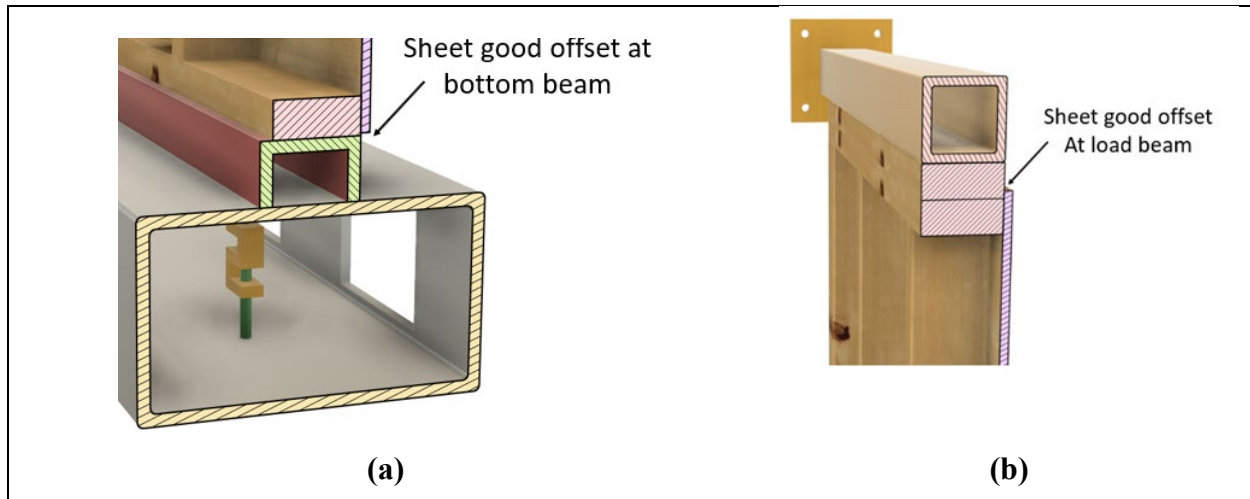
Cross-sectional view of test apparatus with no interference between the sheathing and fixturing.: (a) bottom wood plate- to- sheathing, (b) top wood plates-to- sheathing
